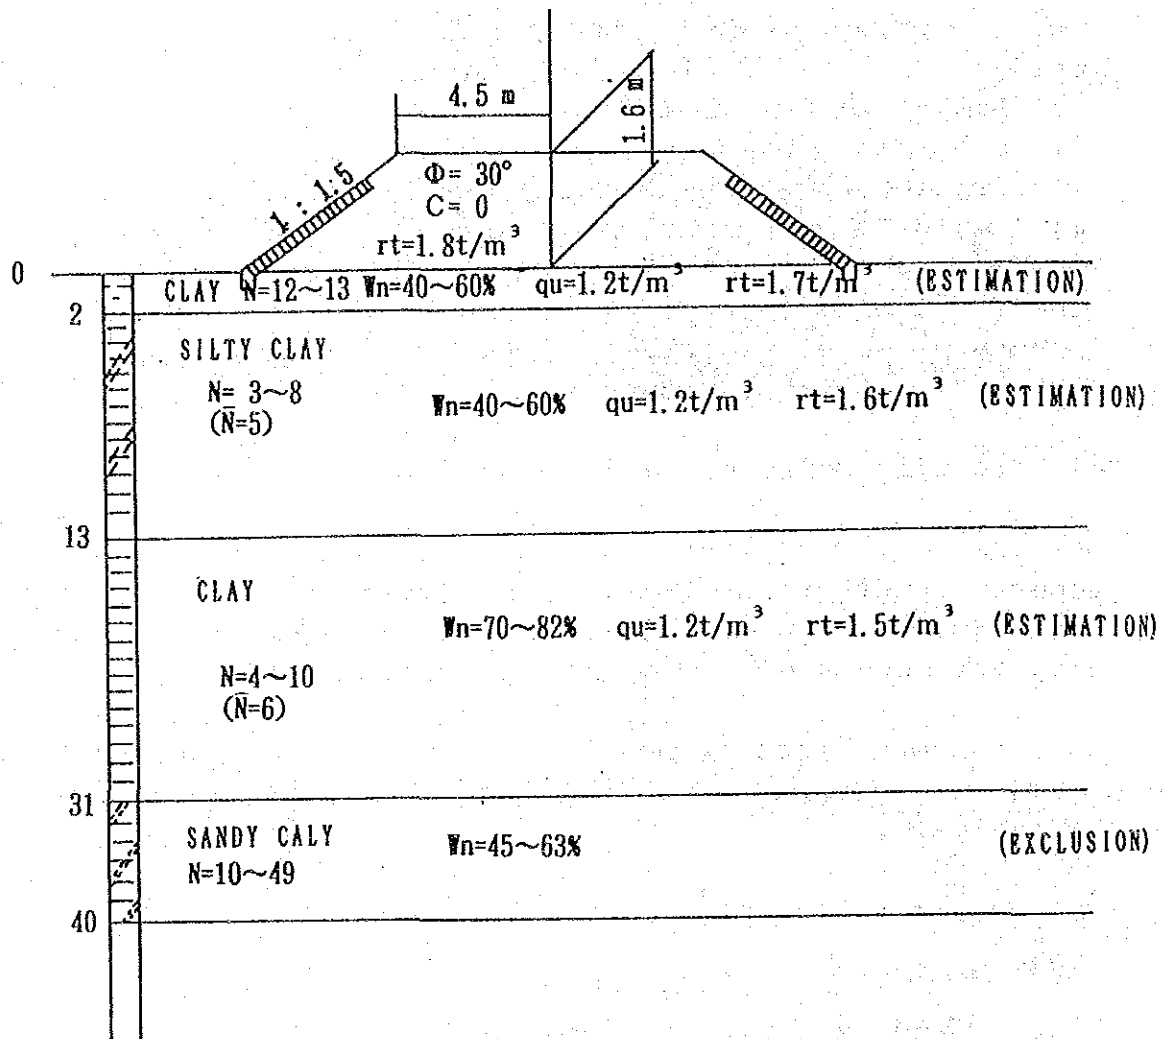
EMBANKMENT SECTION MODEL
